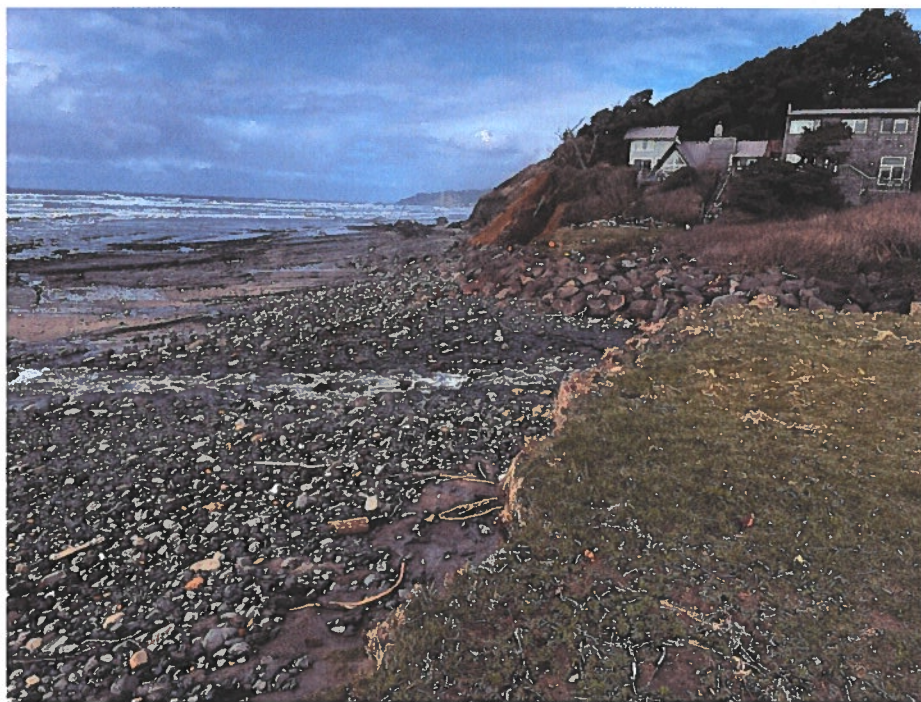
Access Site 11 – Adjacent to Creek Outlet
